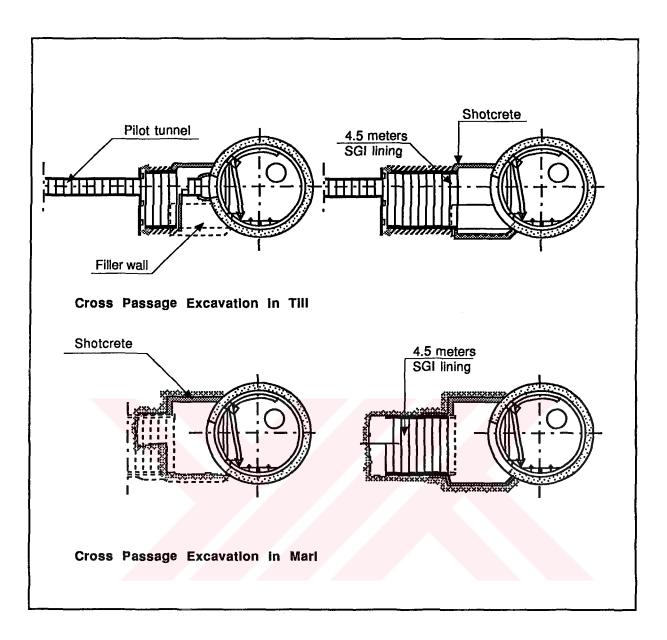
CROSS PASSAGE EXCAVATION
